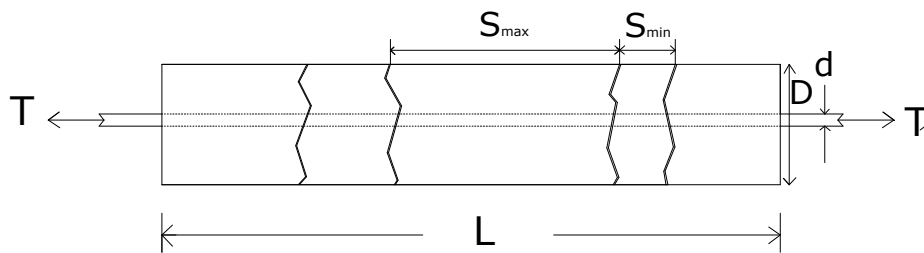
Maximum, minimum and average crack spacing for a typical specimen.
